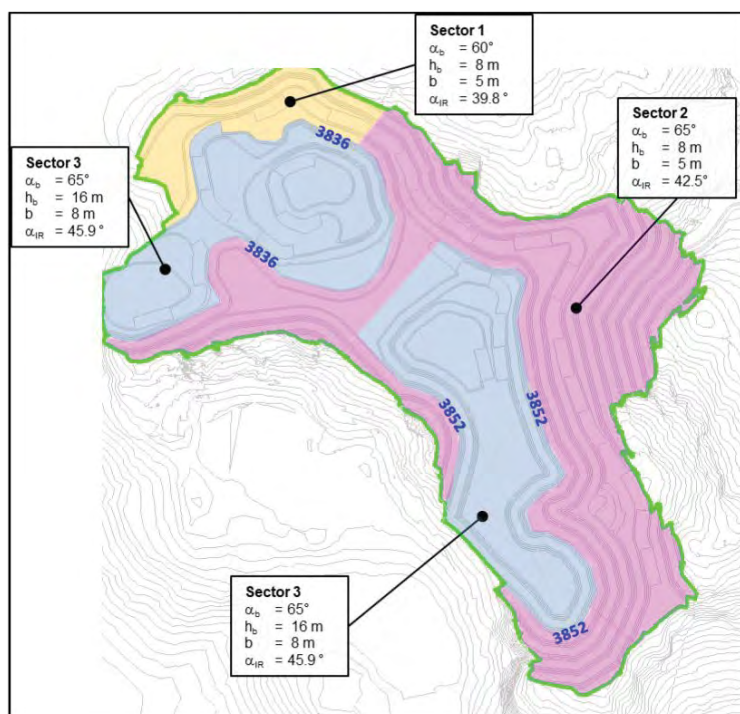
Geotechnical recommendations for Mirador (North Sector) open pit design
